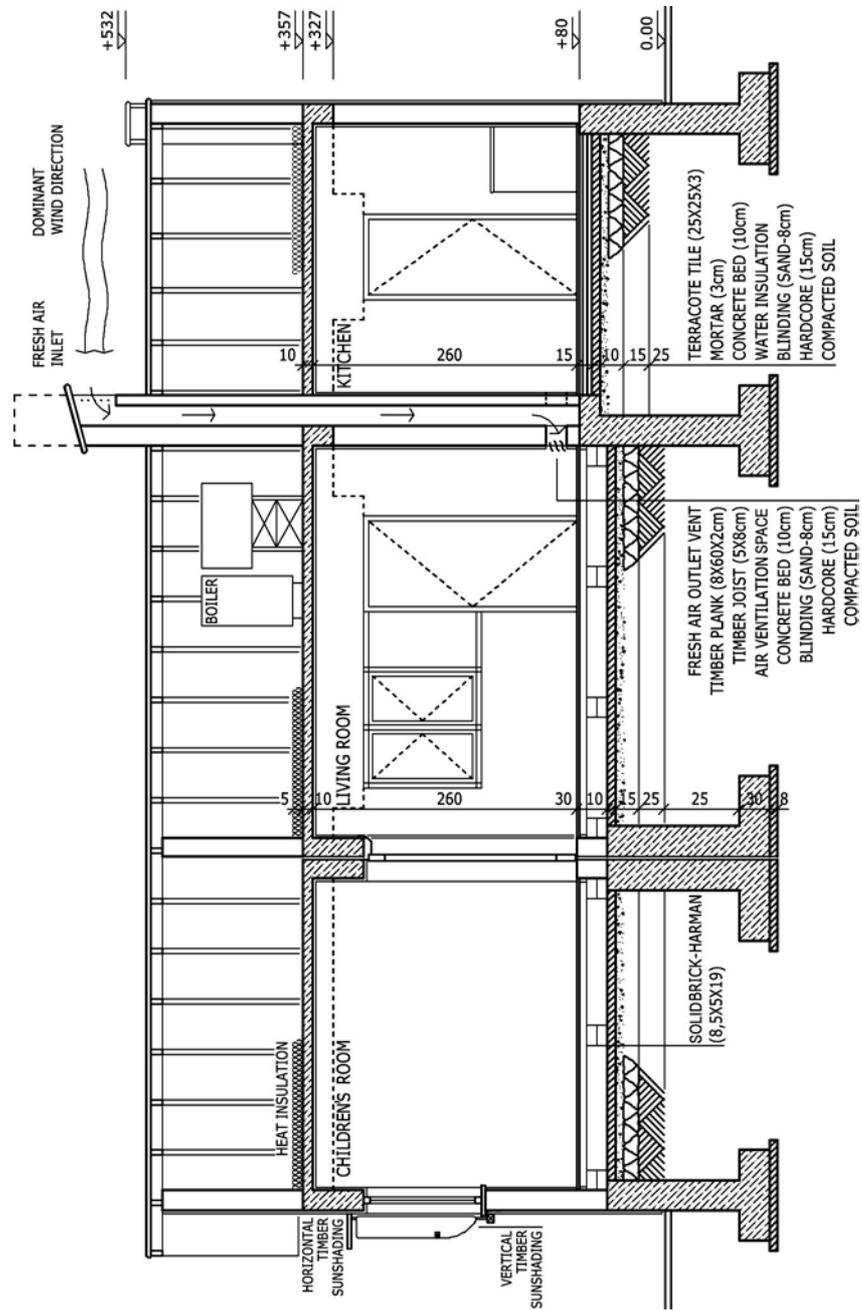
Section A-A of type D₁' dwelling; Scale 1/80
